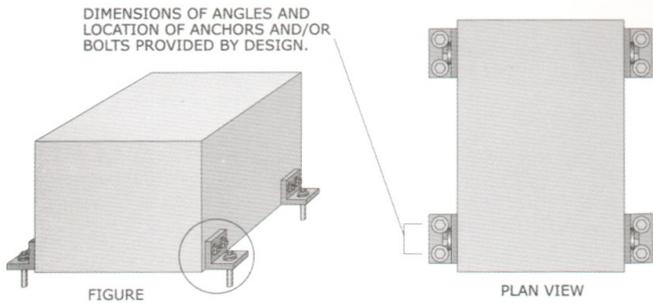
Typical attachment detail of equipment to a supporting structure (FEMA, 2002).
